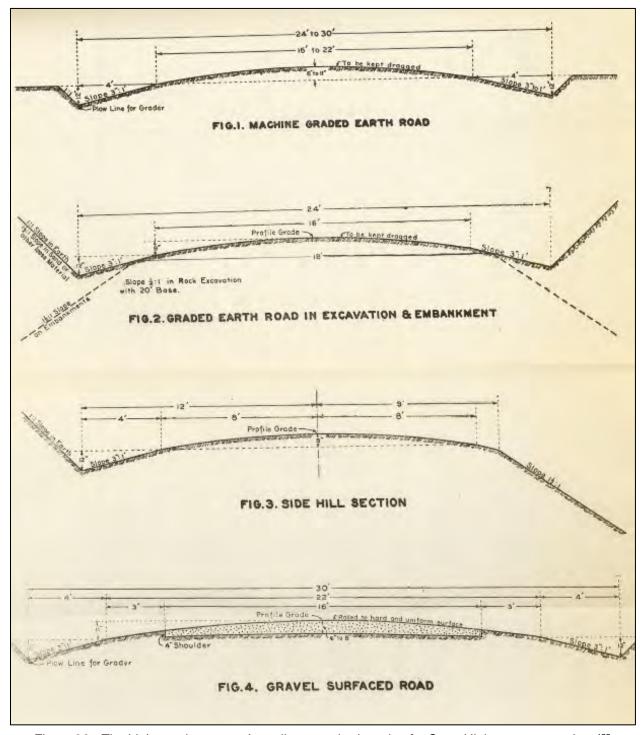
The highway department's earliest standard section for State Highway construction. 189
